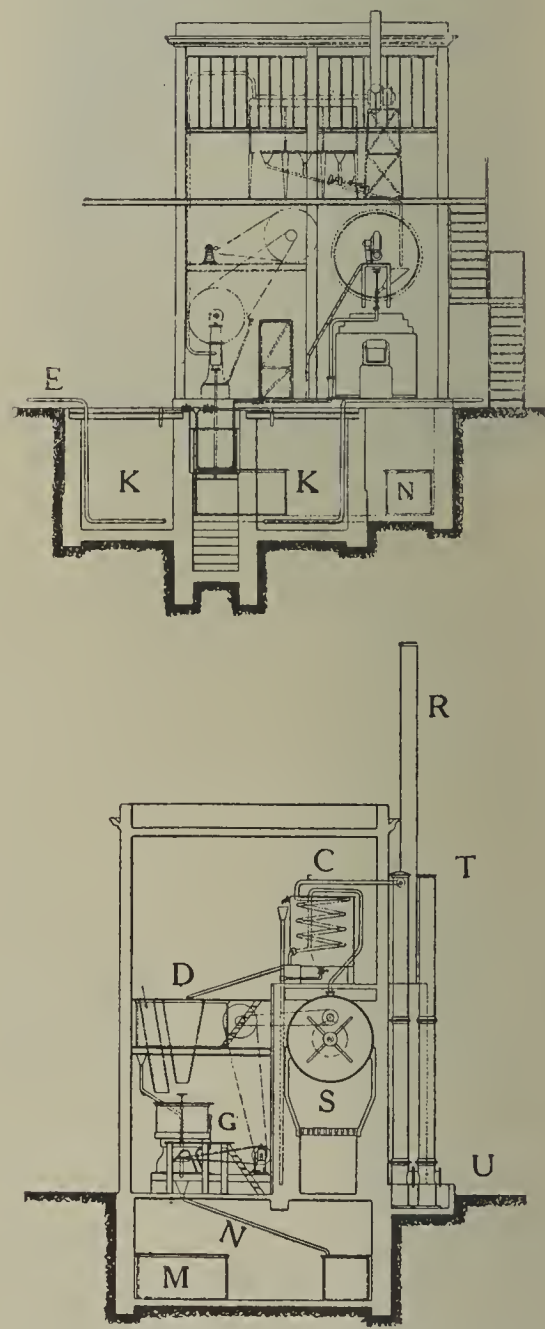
CROSS SECTIONS OF PITCH PLANT.
